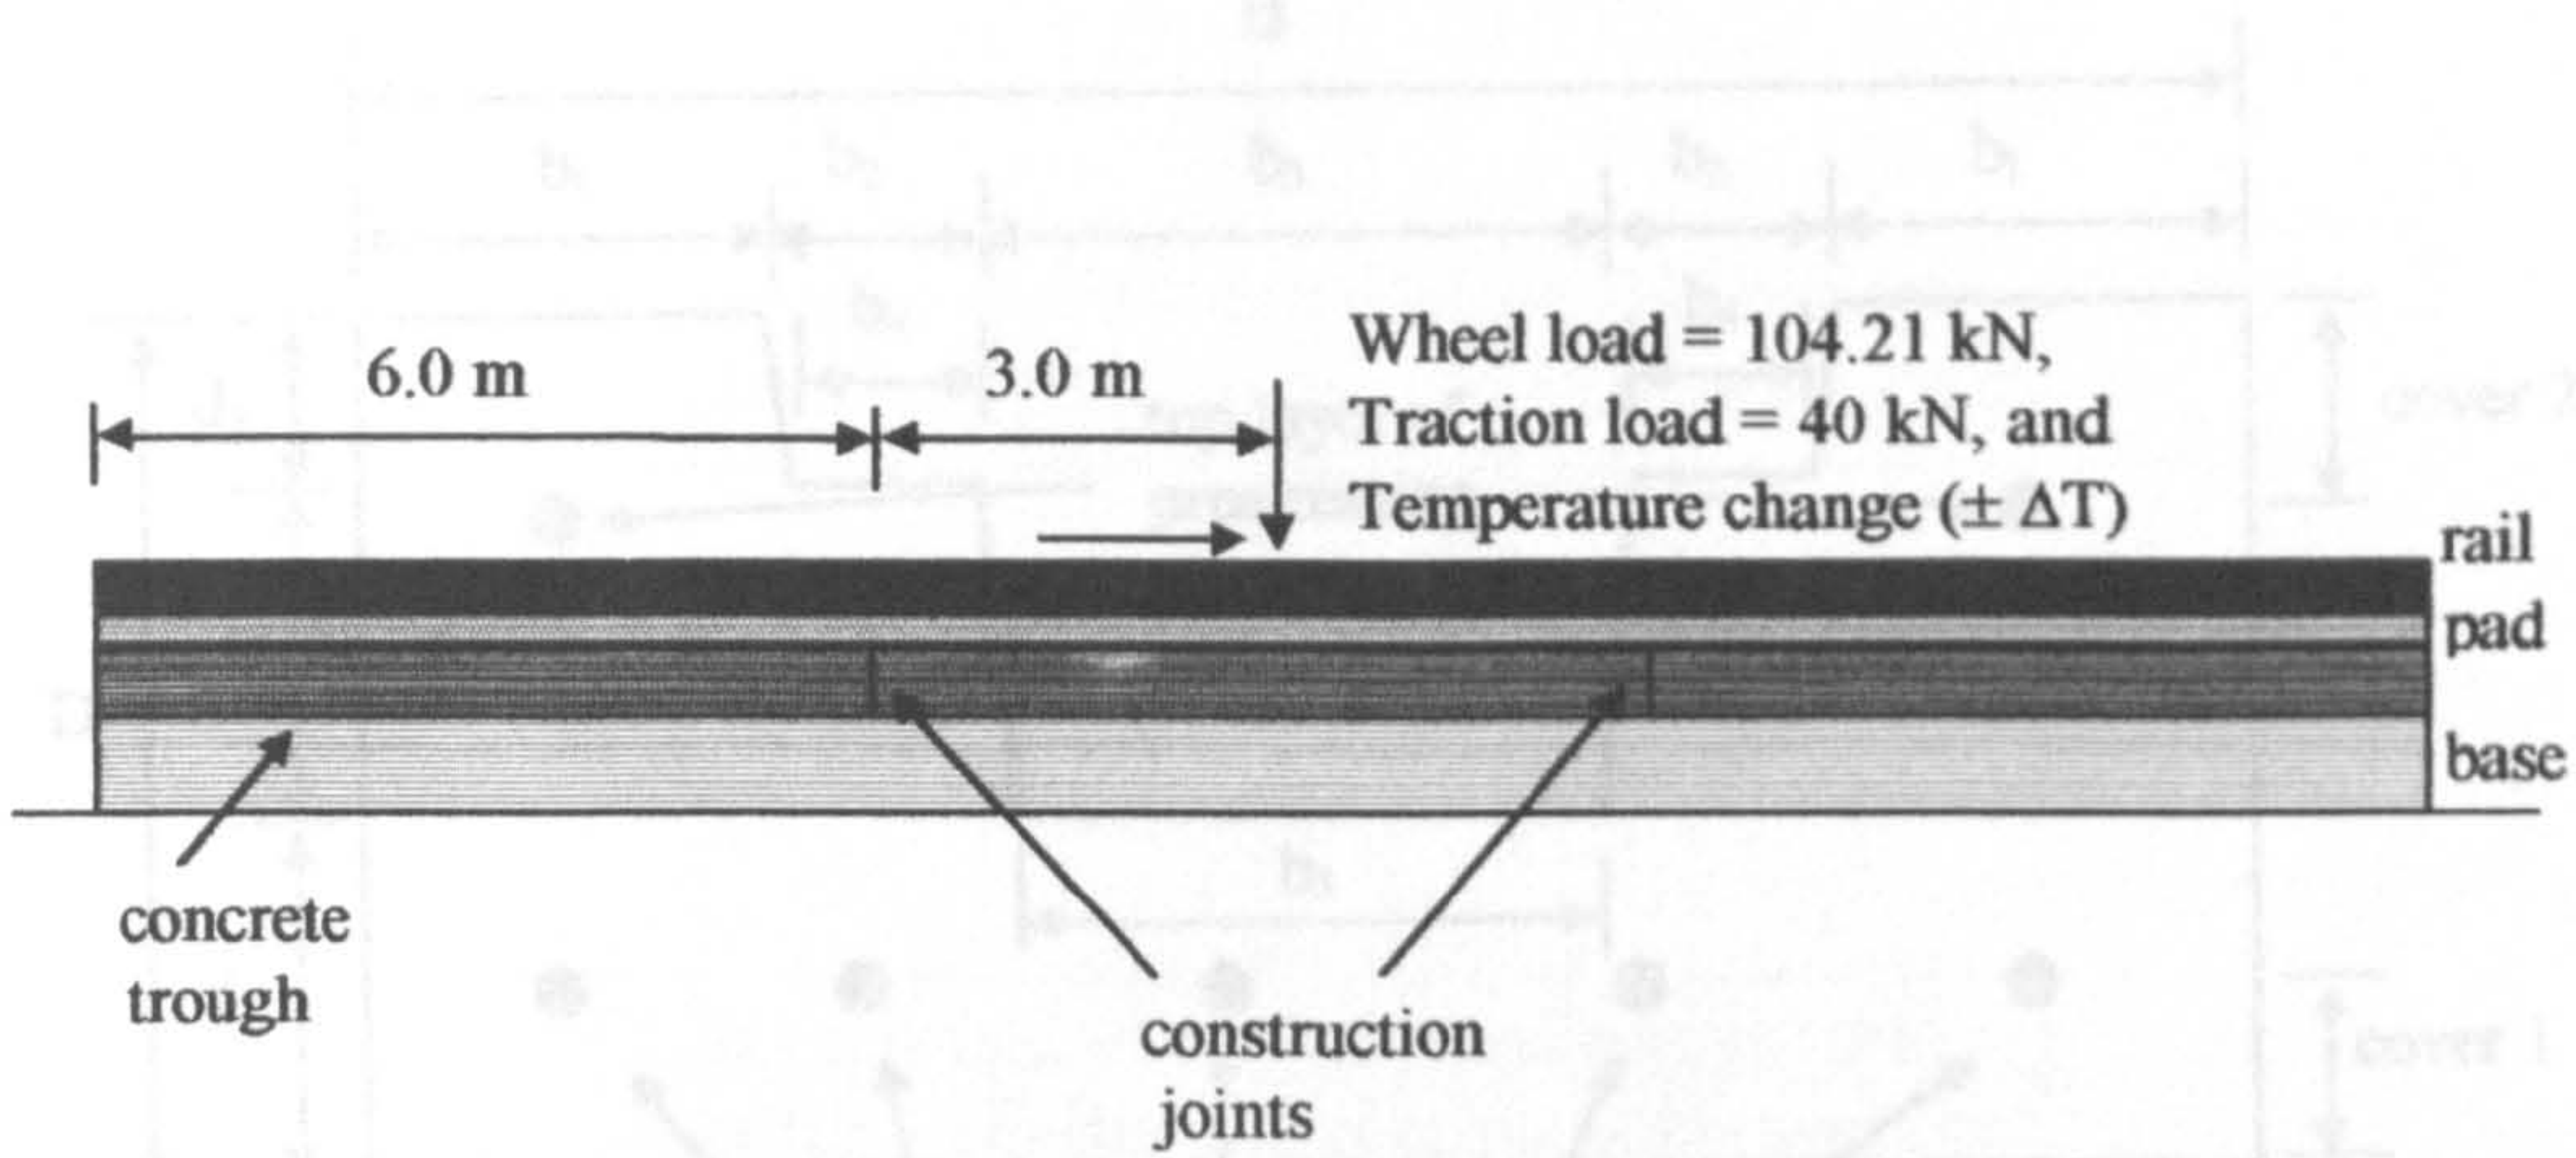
Wheel load at distance 3 m from a construction joint.
